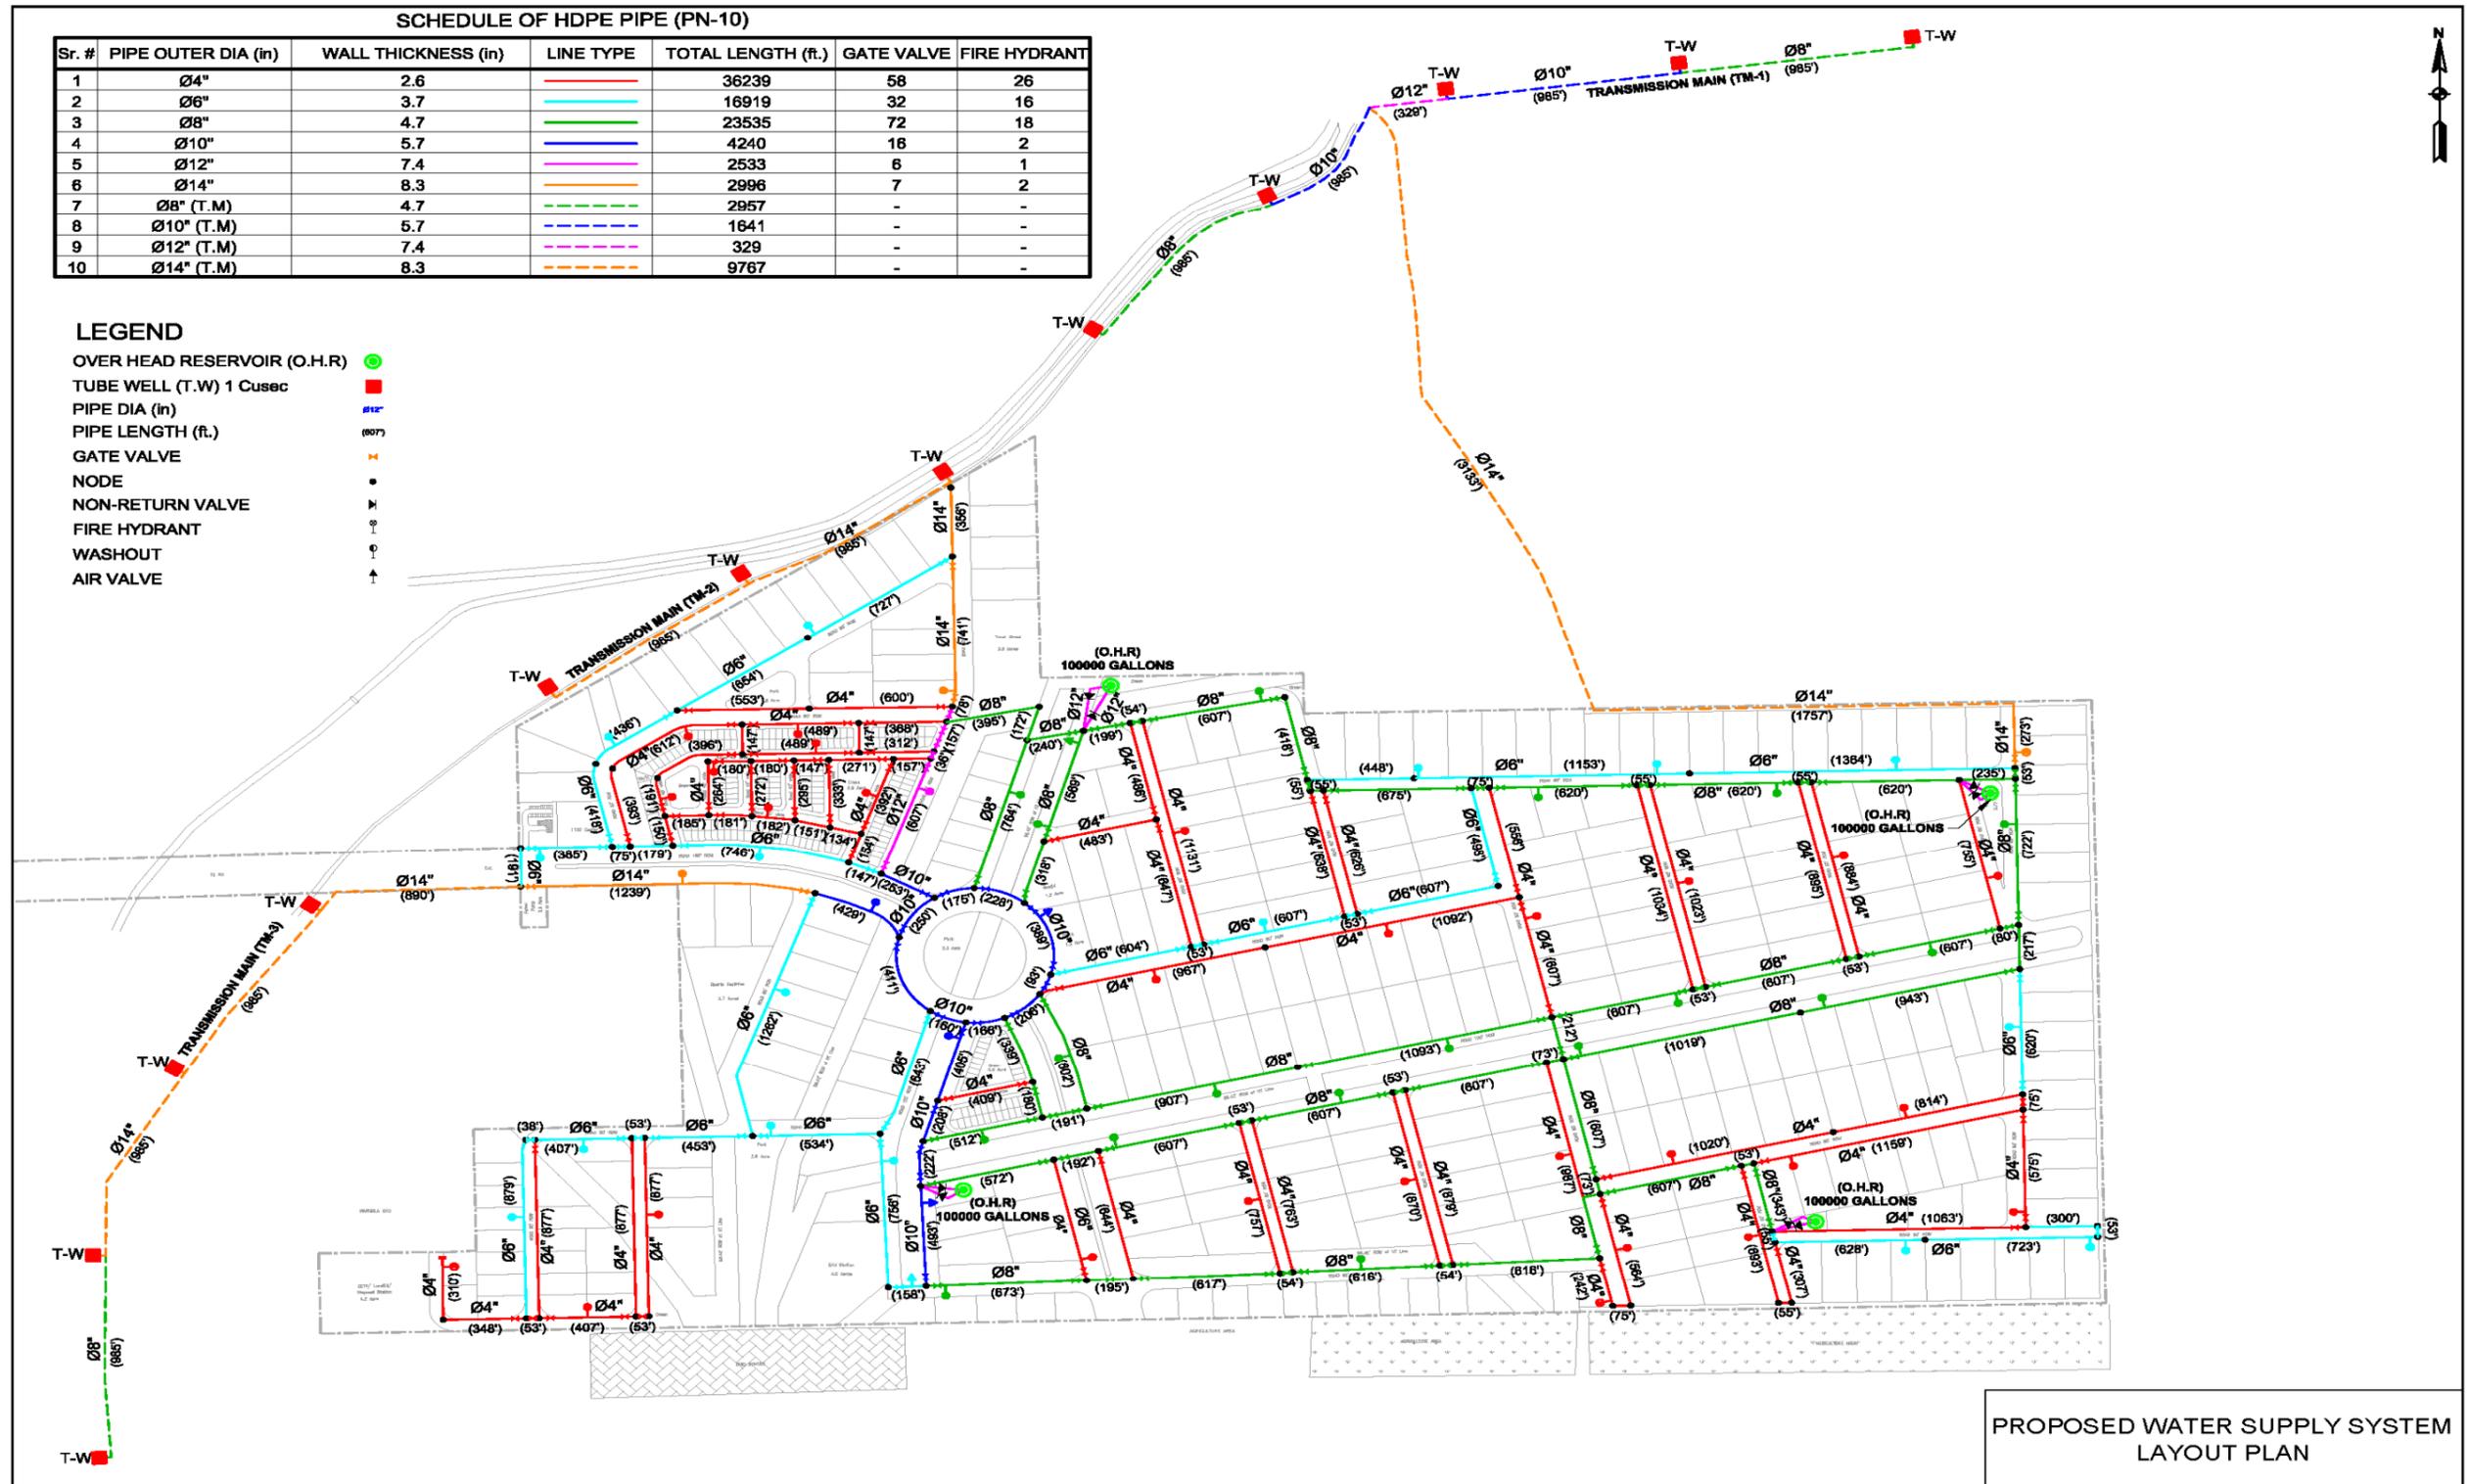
Proposed Water Supply System Layout and locations of Fire Hydrants
